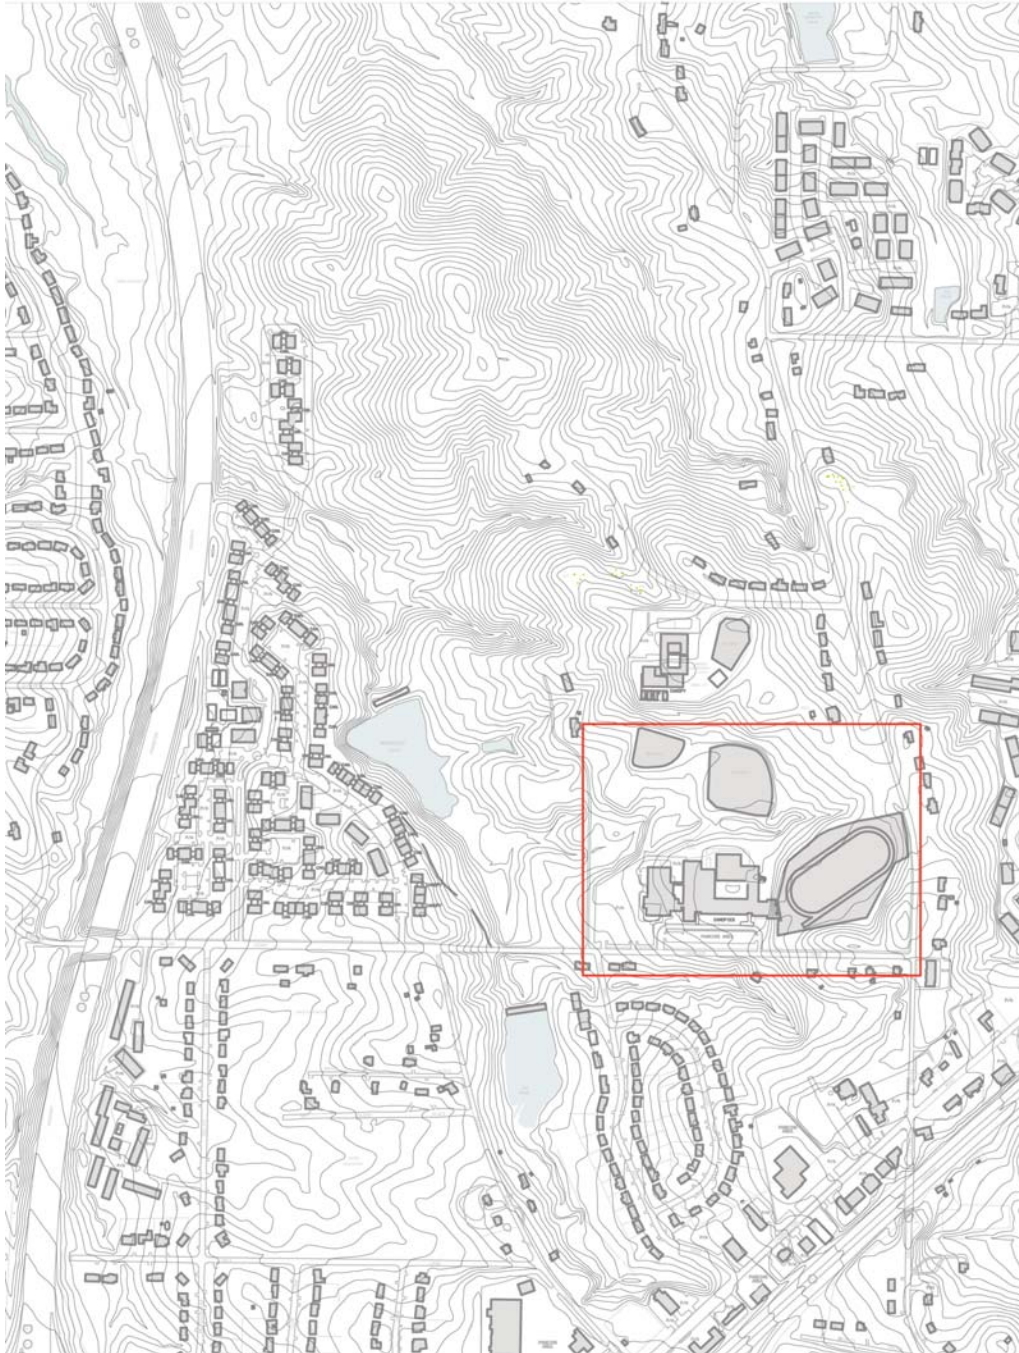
Area plan. Therrell High School and it's site in the current condition are highlighted. Drawing adapted from Atlanta Area Plan provided by the Imagine Lab, Georgia Tech, 2010.
